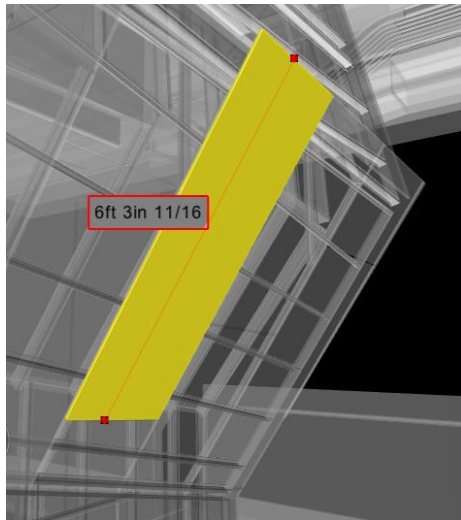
Architectural Screen Wall Wood Panel Dimensions
